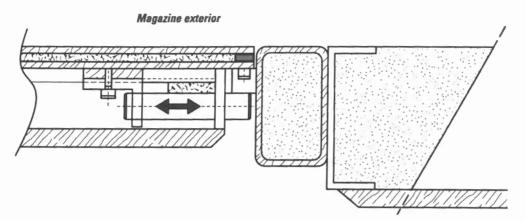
Typical Types 1 and 4 magazine door and frame in closed position.
